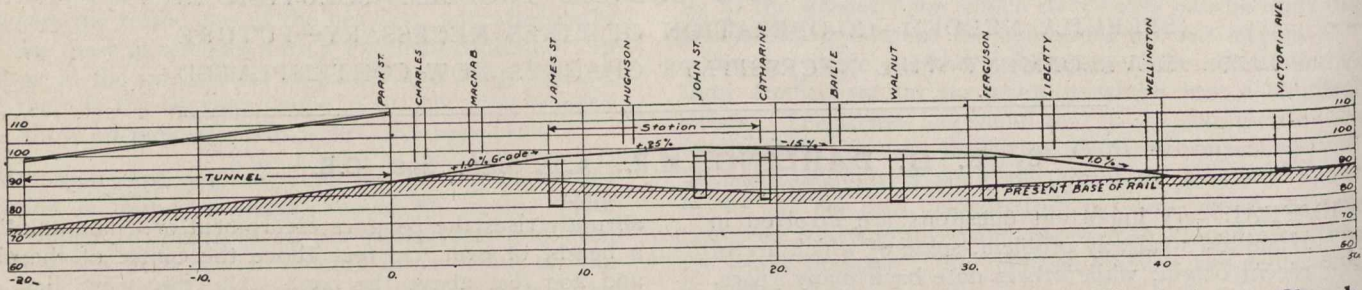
Profile of track elevation plan for the Toronto, Hamilton and Buffalo Railway, by Westinghouse, Church, Kerr and Company.
